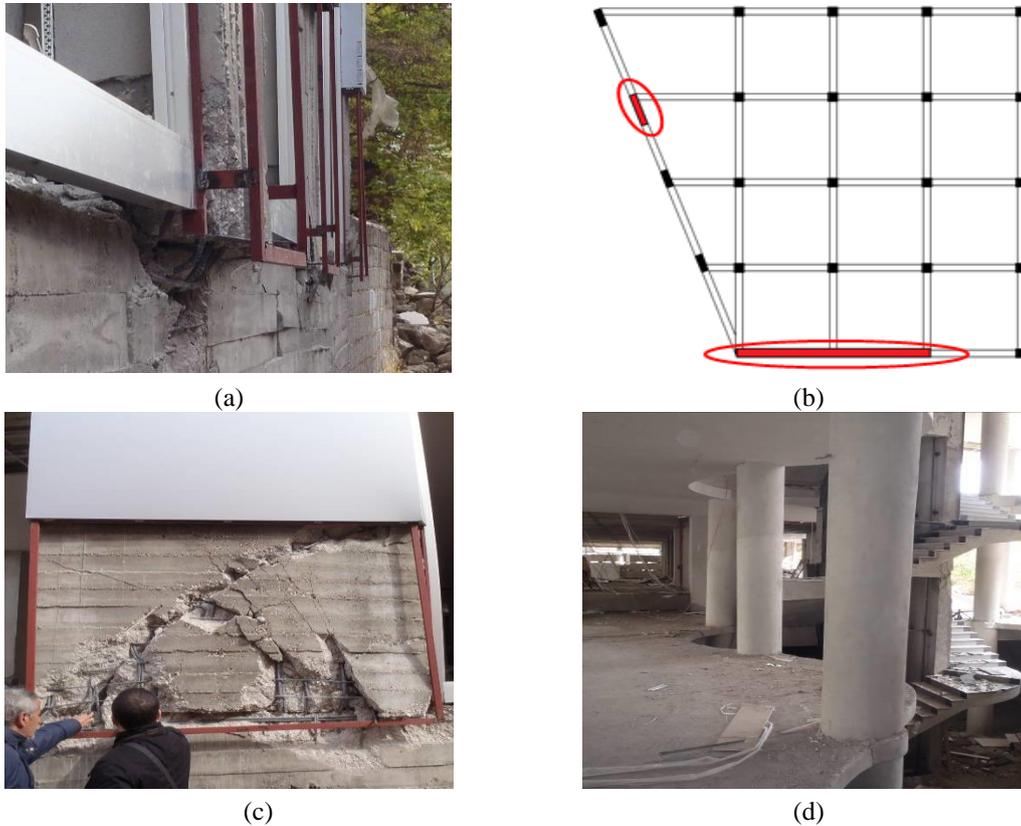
(a) RC columns damaged and displaced out of the building due to unsymmetrical shear walls, b) building plan with unsymmetrical shear walls, (c) RC shear wall with heavy shear damage due to deficient changes of the design project and (d) undamaged circular columns after earthquake
